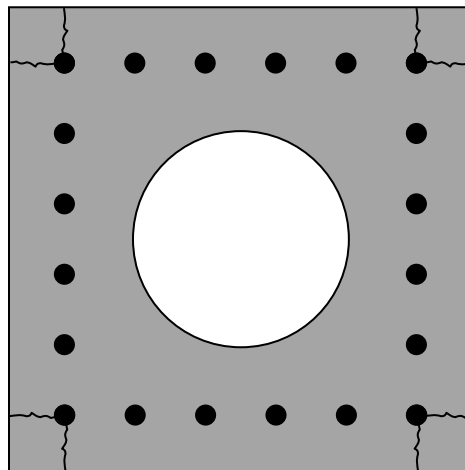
Cracking and delamination pattern on the cross-section in splash and tidal zone
